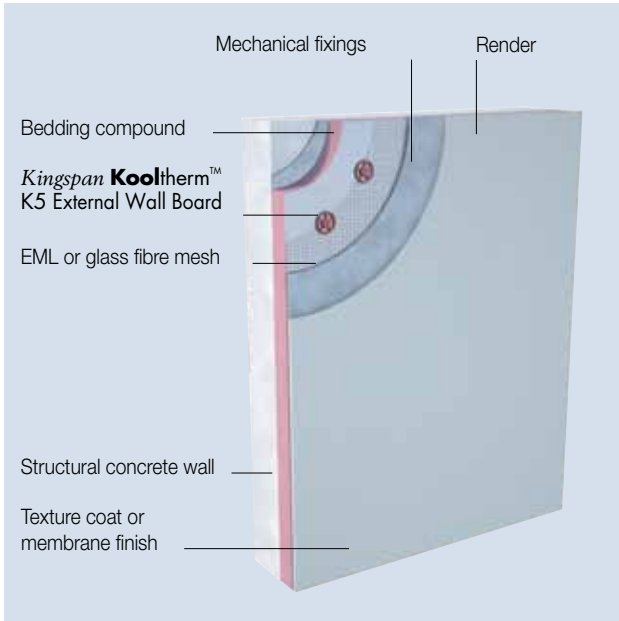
Kingspan Kooltherm™ K5 External Wall Board insulated render system on concrete wall
